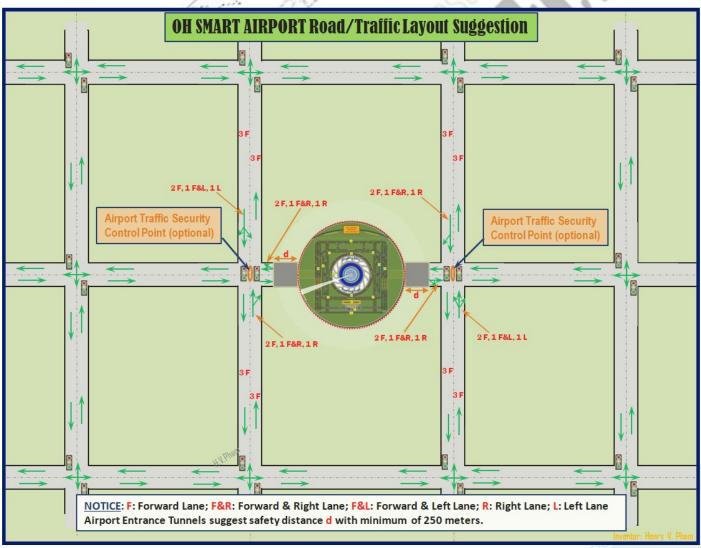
OH SMART AIRPORT - Recommended Road/Traffic Layout
